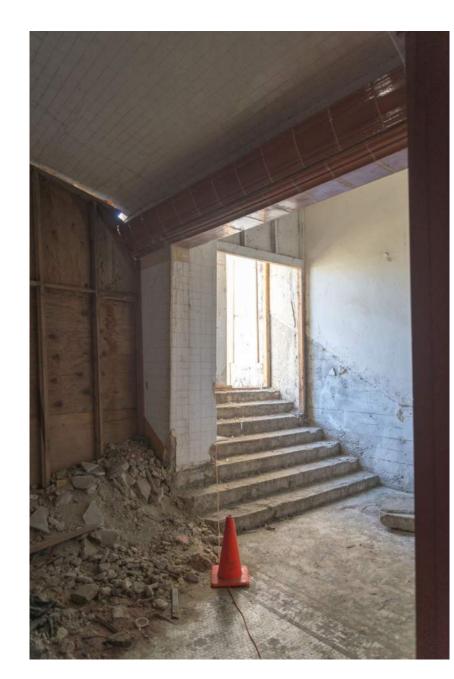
SW entry stair to tunnel, 2016. Source: Michael Wada / Grunion Gazette.
